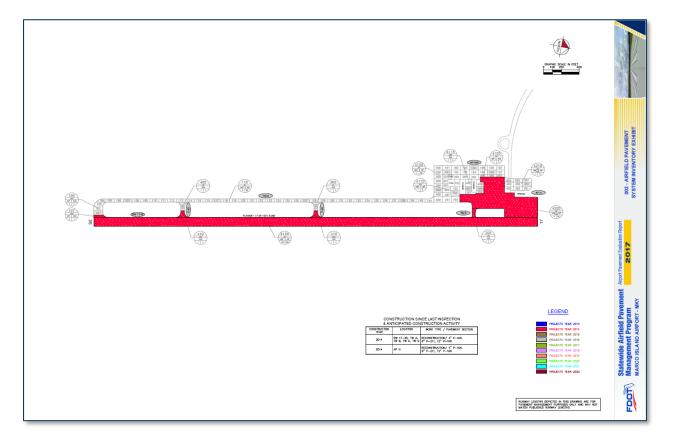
2017 Airfield Pavement Network Definition Exhibit
